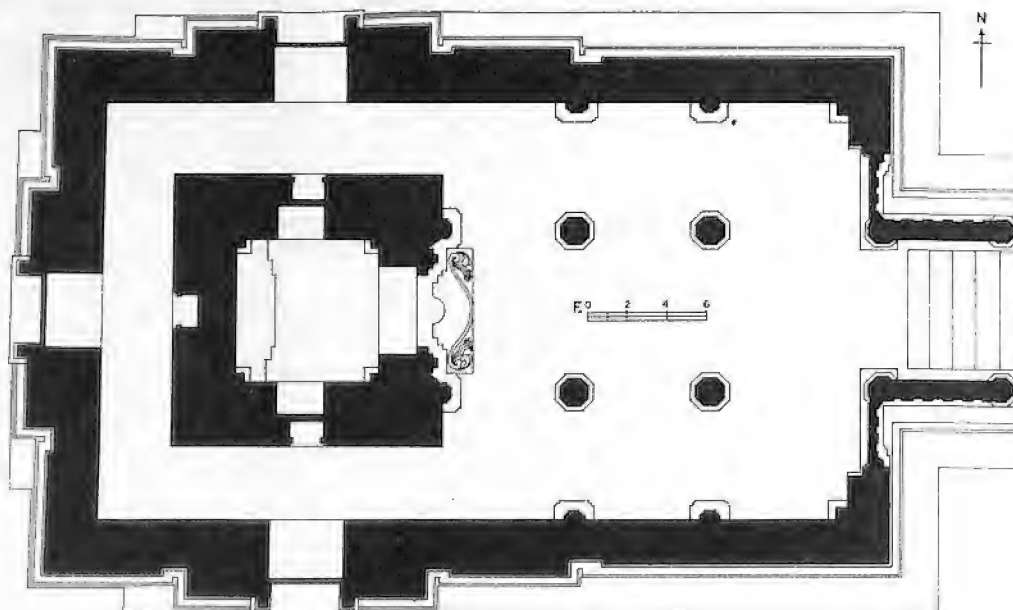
Kharāḍī. Kālikāmātā temple, plan.
